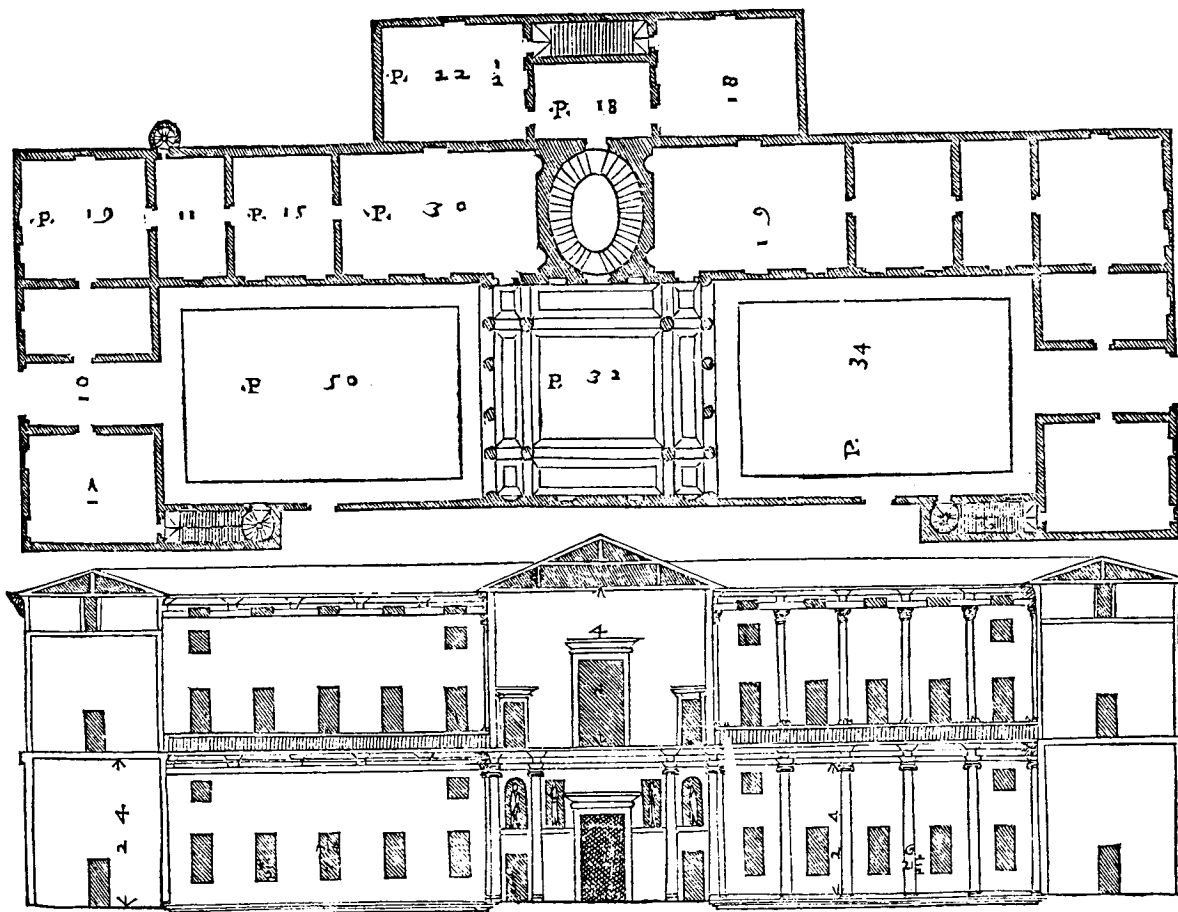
Andrea Palladio: plan and section of Palazzo Della Torre (from "Quattro Libri")
